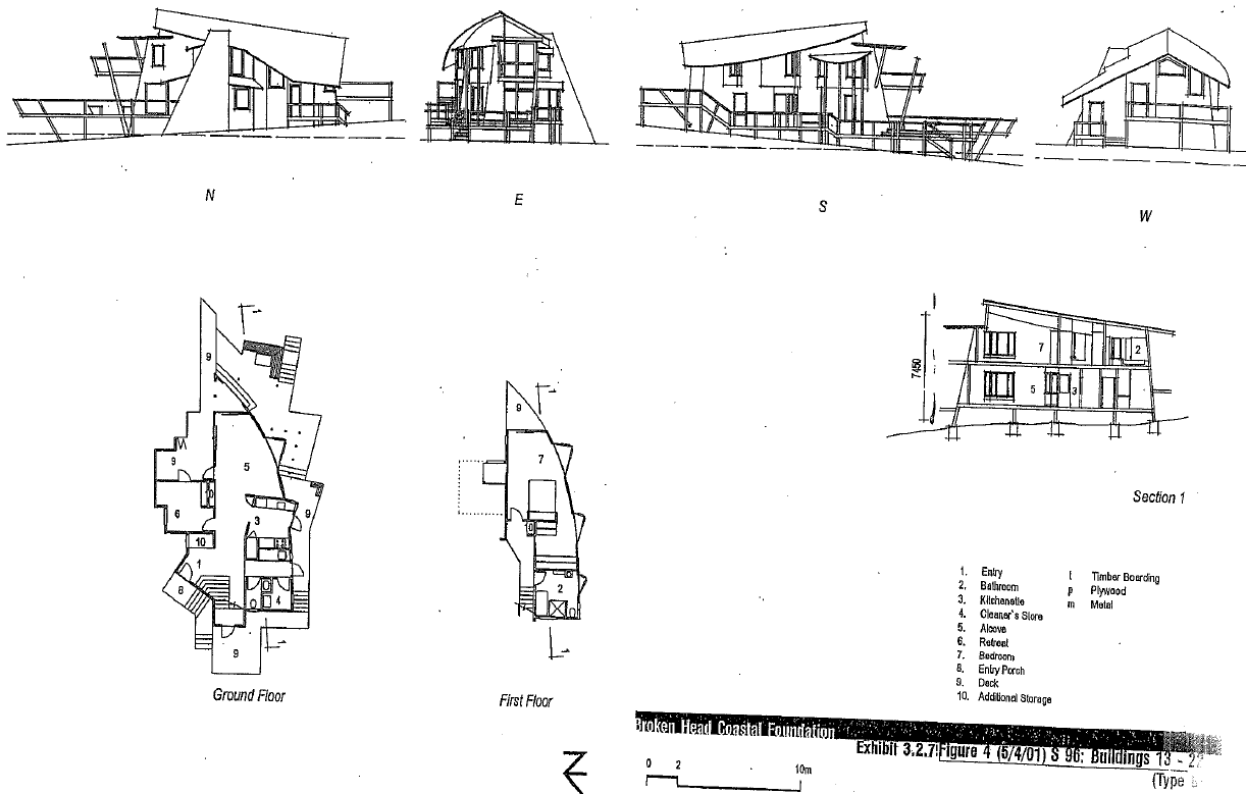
Extract from "Type B" Court approved plans (17.2001.7046.1)
